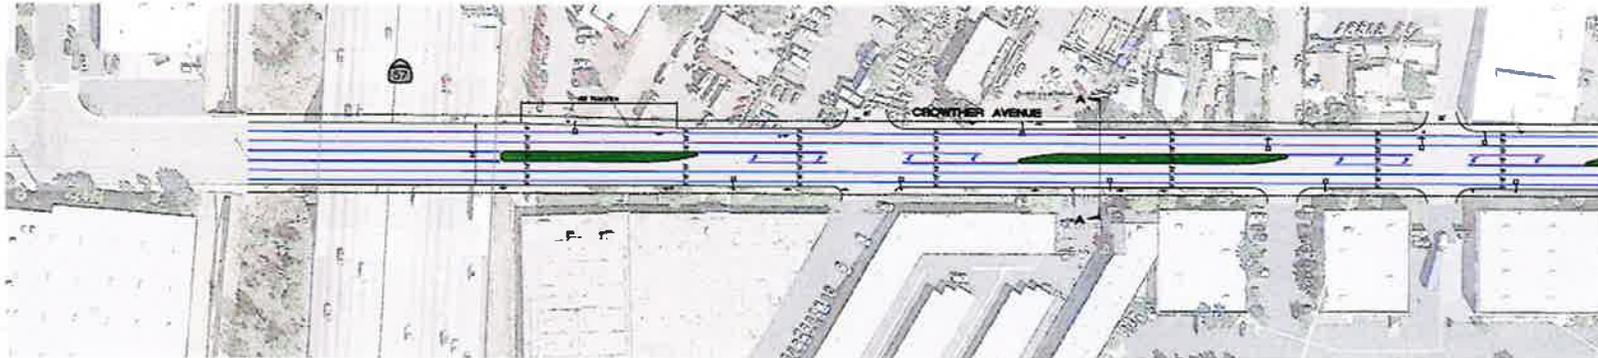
CROWTHER AVENUE CROSS SECTIONS - West to Bradford Ave
